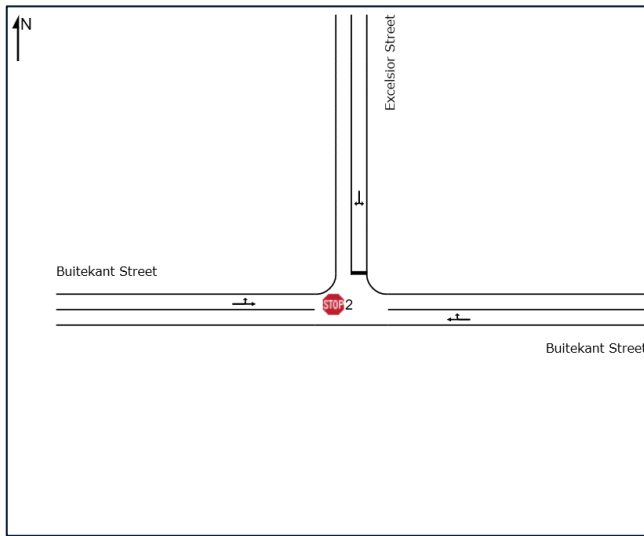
Buitekant Street and Excelsior Street: Existing Layout
